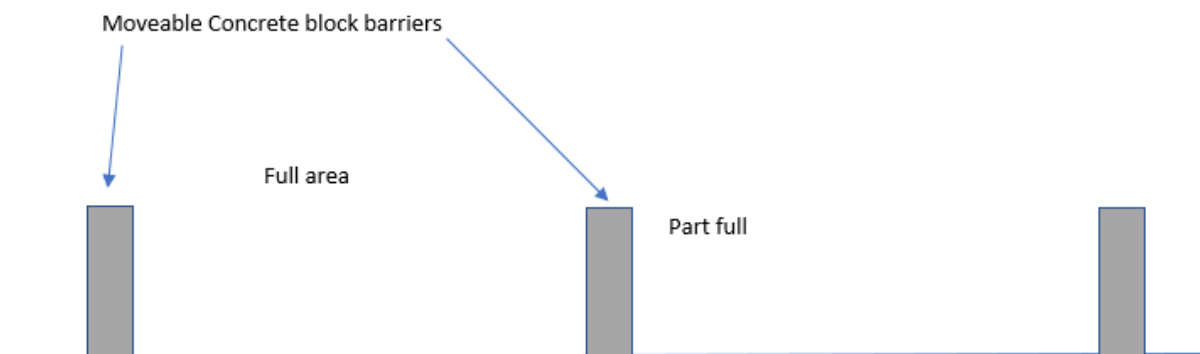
Example of clean Fill storage prior to testing and rejection or transfer to gravel pit site.
